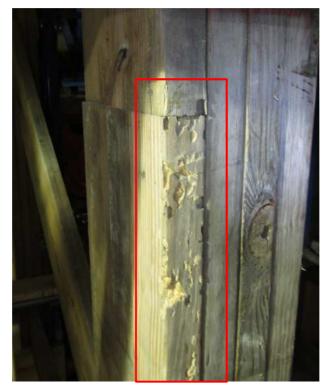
Termite damage on shoring tower leg with wood filler added
